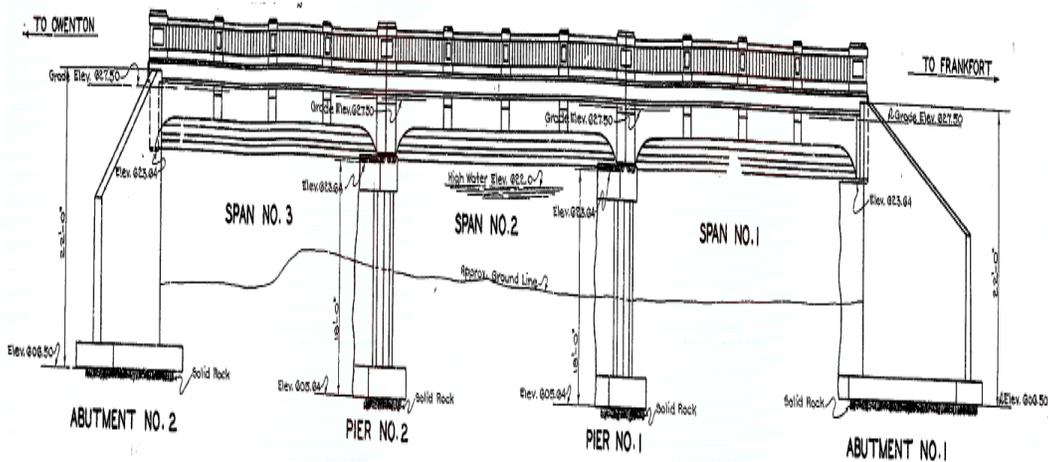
A typical full height closed or high abutment (bridge No. 094B00041N)
